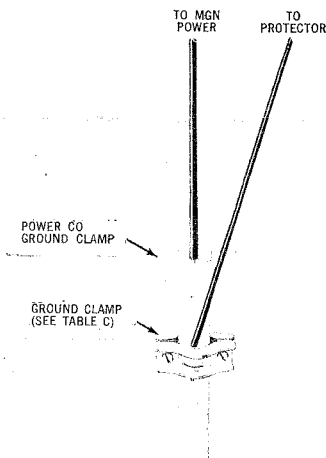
MGN Power Grounded to Ground Rod—No Water Pipe—Connection to Pipe Not Possible
